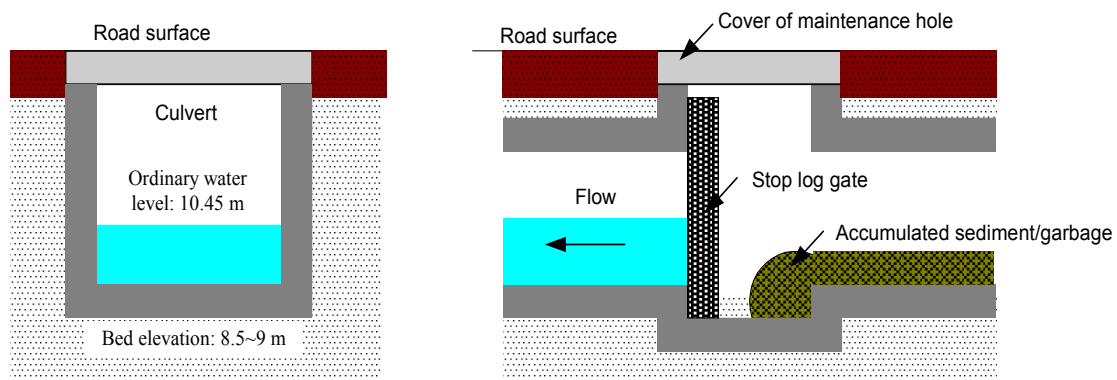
Cross Section of Stop Log Gate to be Installed
